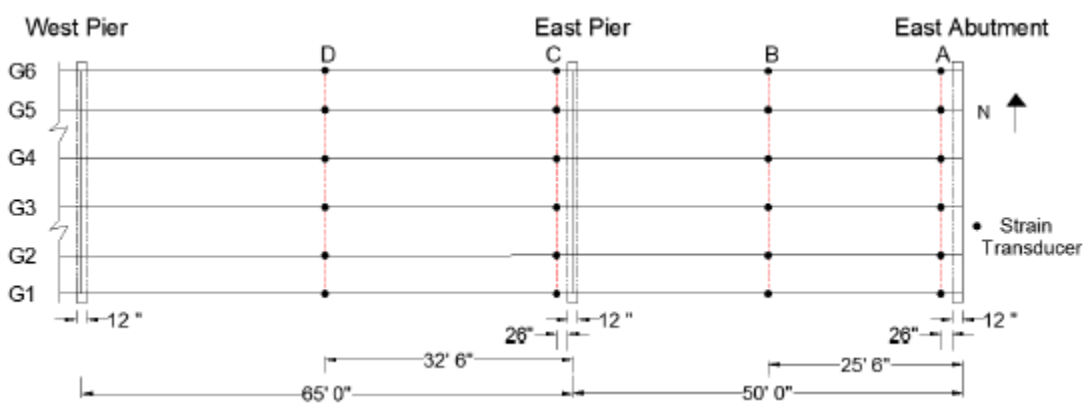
Sioux County Bridge Plan View of Strain Transducer Locations
